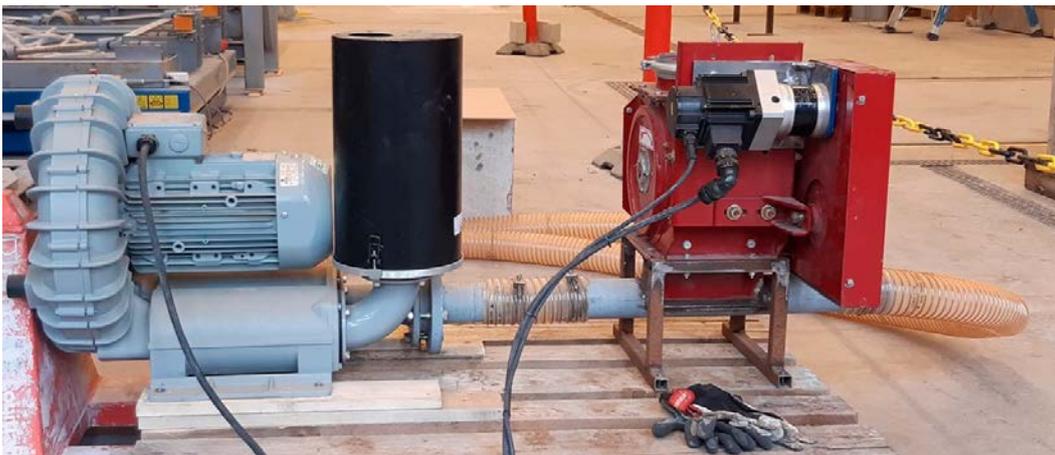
Equipment for installation of pellets in the void between the blocks and the tunnel wall.
